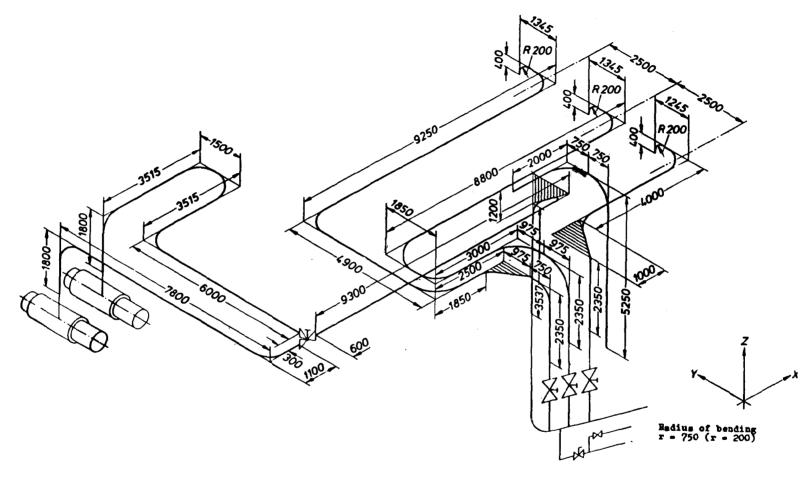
PIPE LAYOUT SHOWN IN ISOMETRIC PROJECTION (EXAMPLE)
